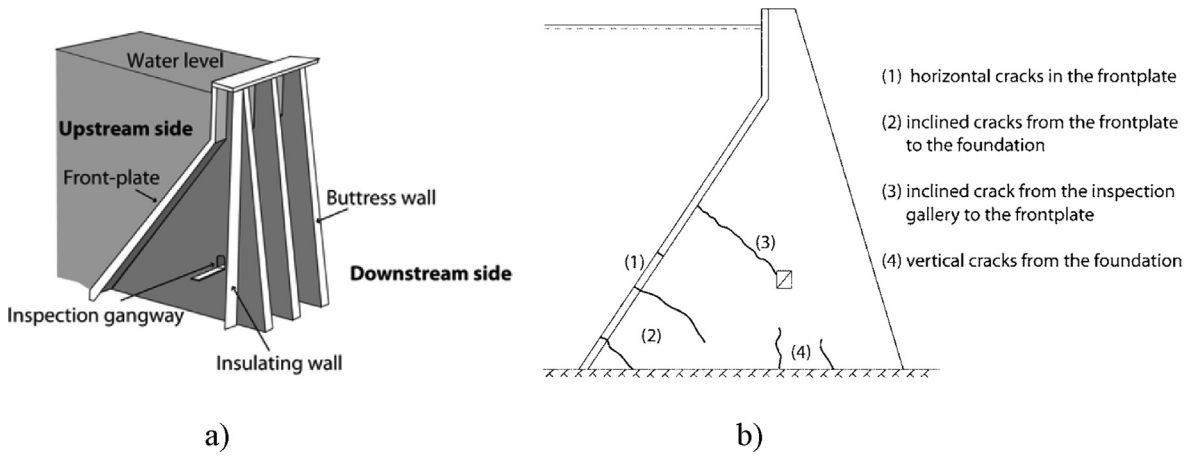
a) Buttress dam layout and b) cracking observed on-site of the Storfinnforsen hydropower dam [63,64].
